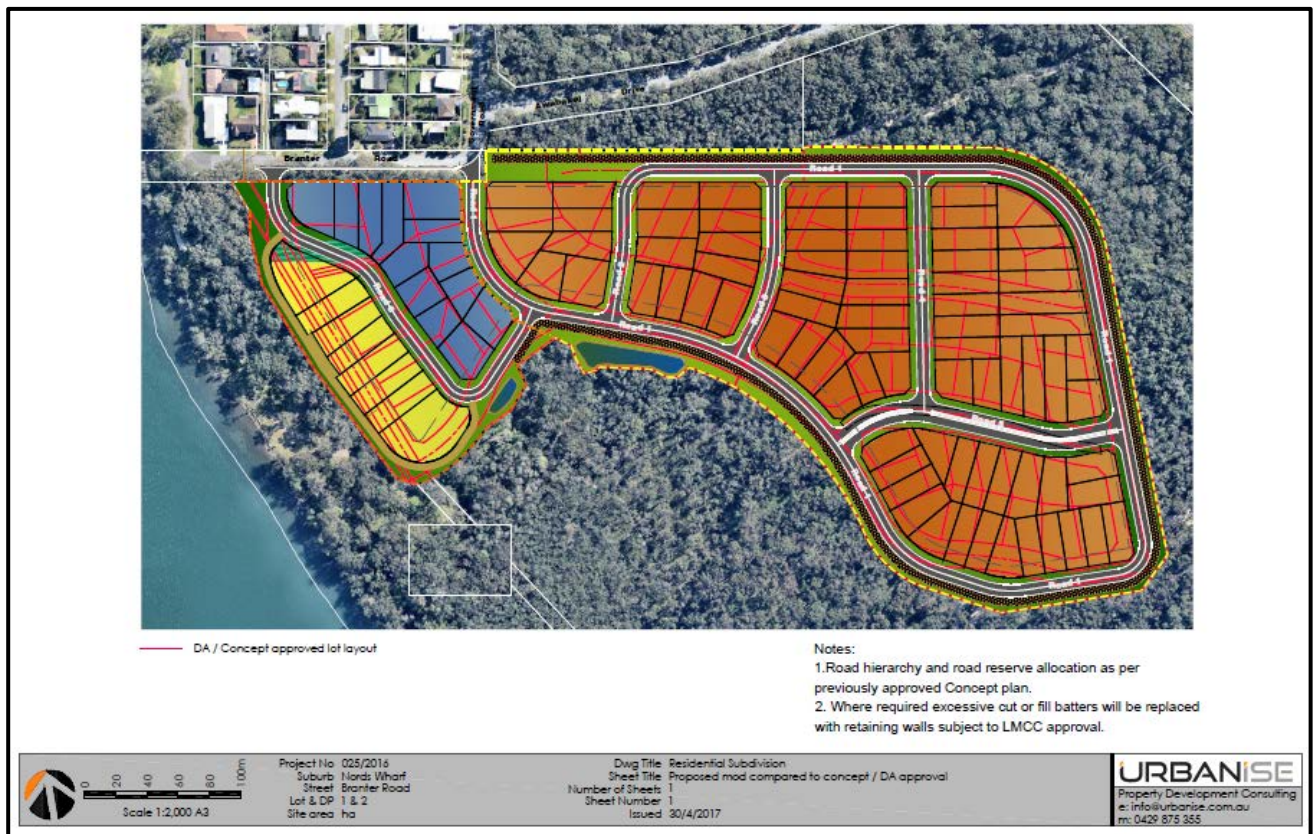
Overlay of proposed amendment to subdivision on original concept plan.
